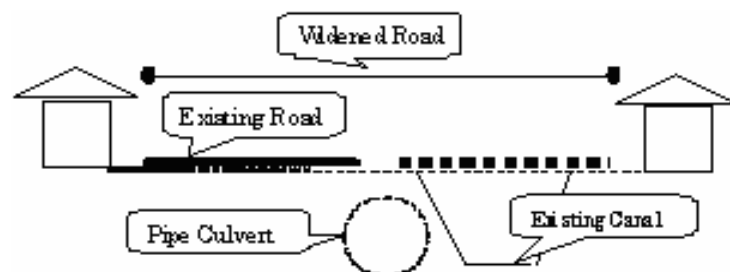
Proposed Cross Section of Jl. Abdullah Daeng Sirua
